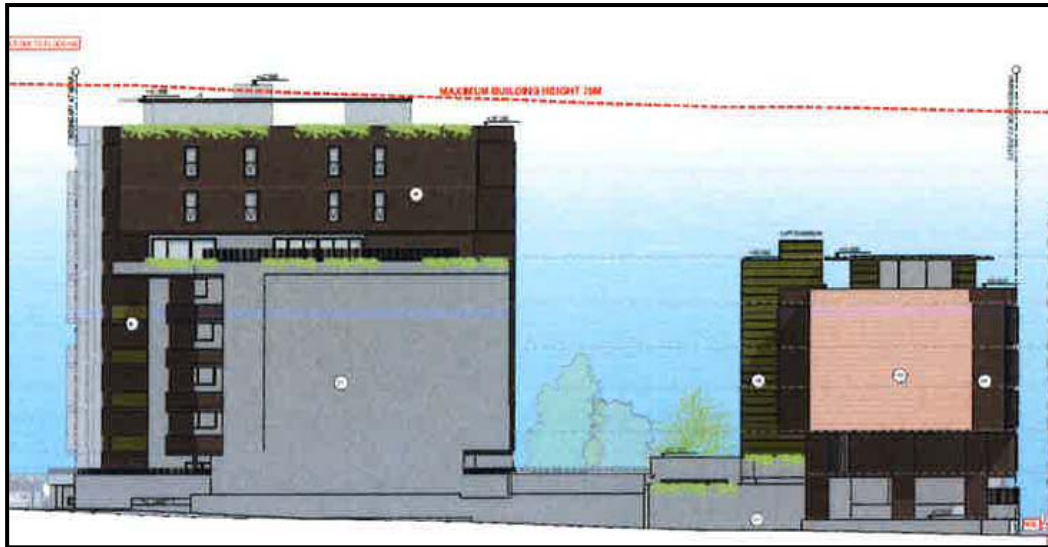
View of the northern elevation noting the extent of the proposed building height variation.
